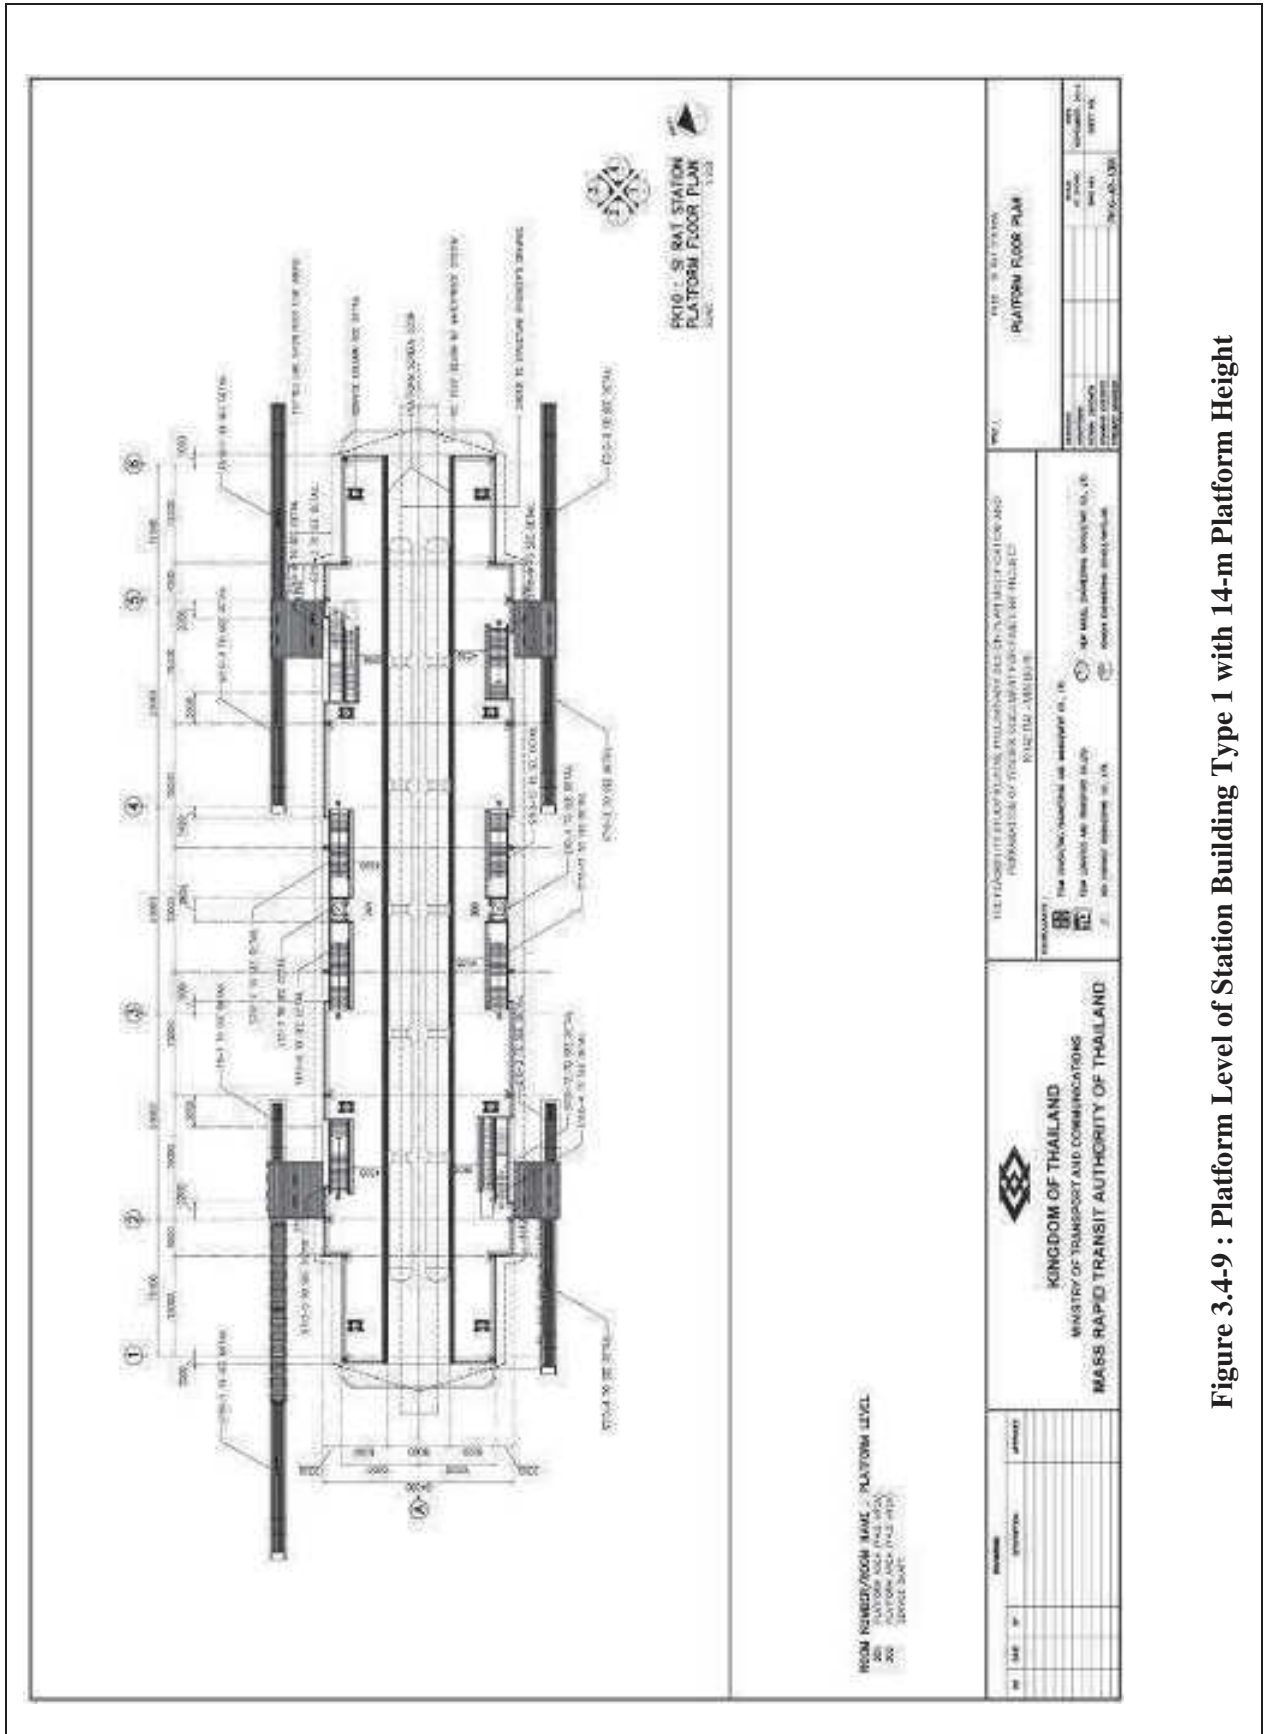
Platform Level of Station Building Type 1 with 14-m Platform Height
